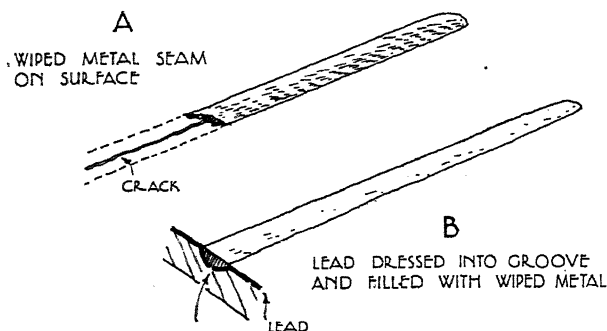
WIPED LEAD SEAM REPAIRS TO LEAD ROOFS AND GUTTERS
